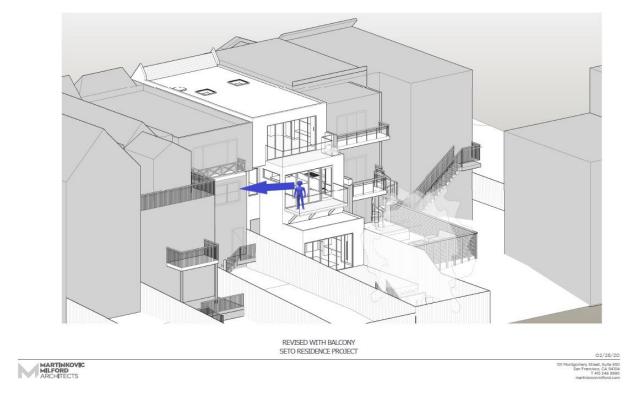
"Plan C" Project Sponsor's Modified Plan included in March 3, 2020 Planning Commission letter from Project Sponsor with sight lines into my window
